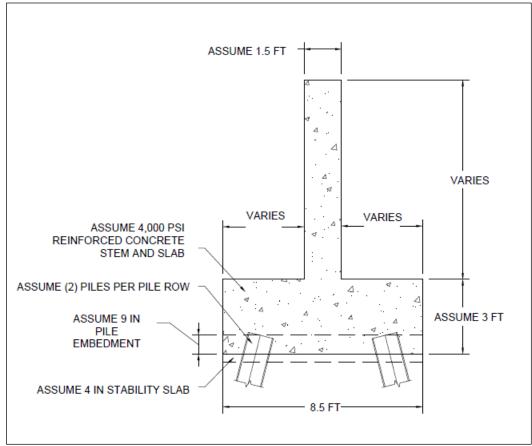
Typical Floodwall Cross Section for all Alternatives with Floodwalls
